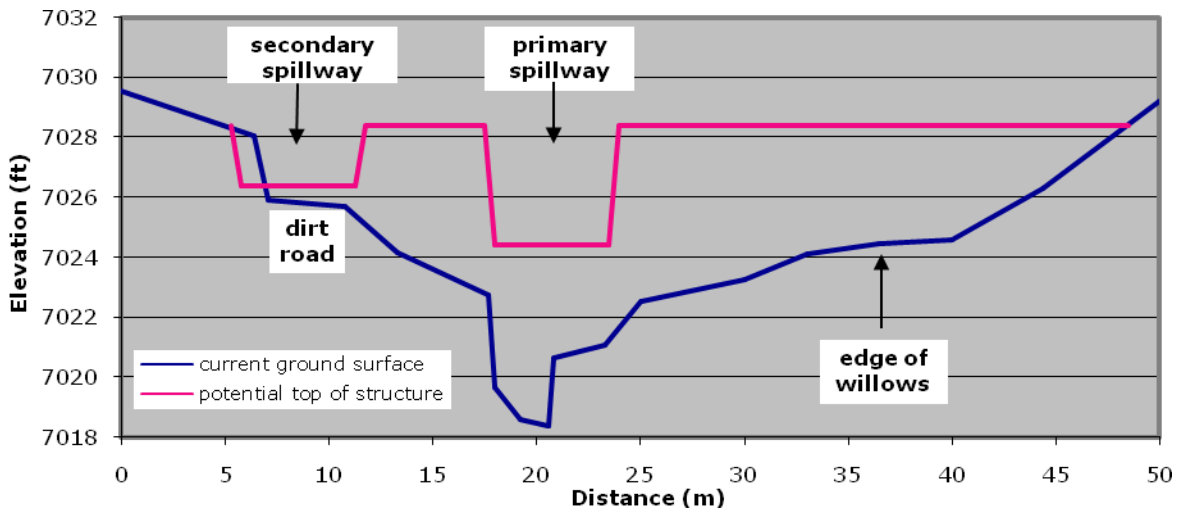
Cross-section profile of proposed DP Canyon grade-control structure
